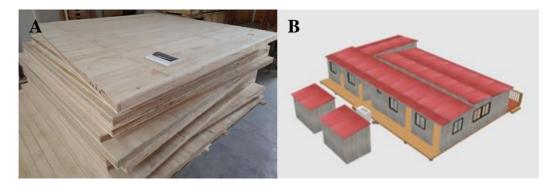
A) Infrastructure walls ready to be assembled, B) 3D image of the exterior of the Research Station.
